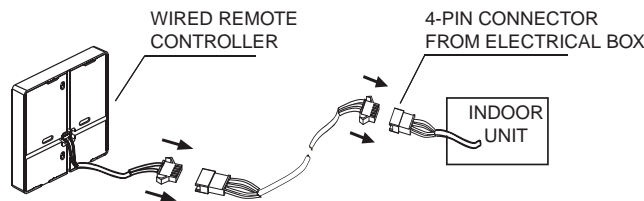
Remote Wired Controller (Programmable) Wiring
